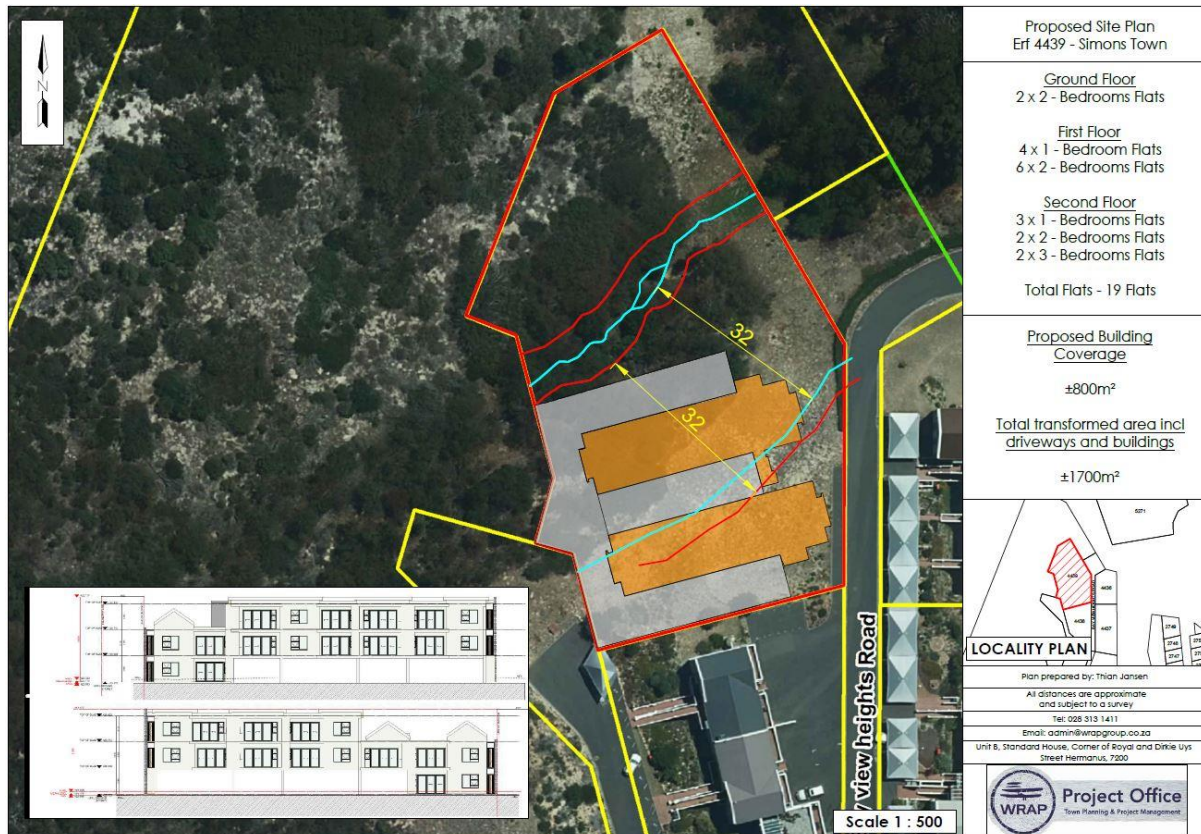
Alternative 2 (PREFERRED) – proposed site plan for the residential development
